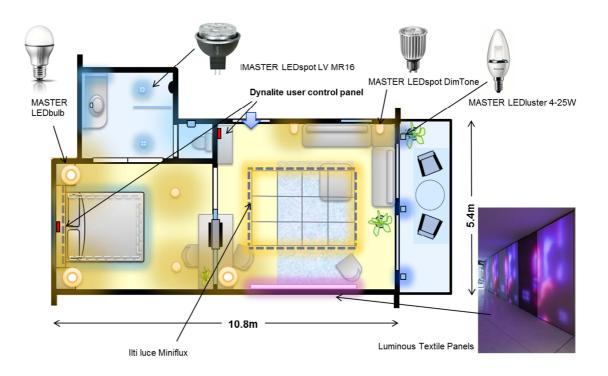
EXAMPLE OF LIGHT PLAN OF LUXURY ROOM OR SUITE
